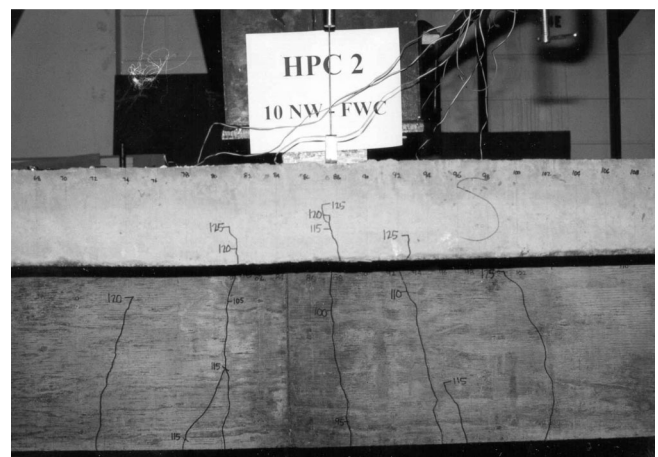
Multiple-strand development length specimen HPC-2 after failure (south face).
